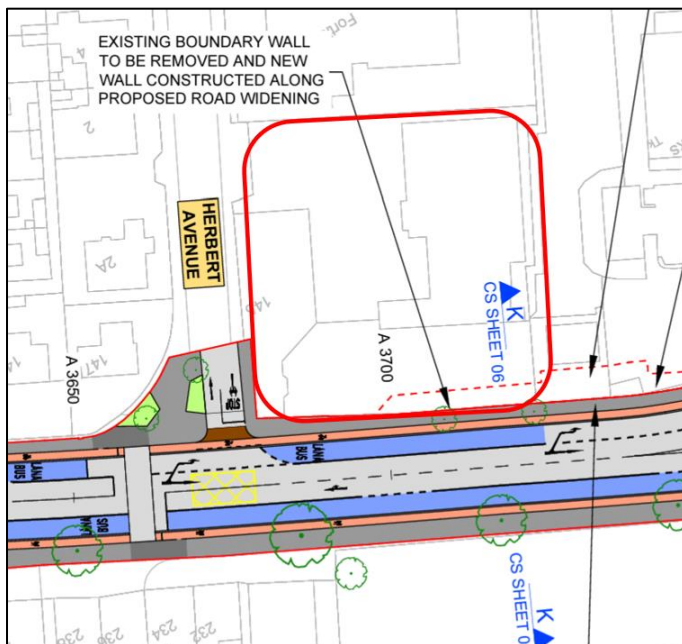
Proposed new Layout at 133-145 Merrion Road
